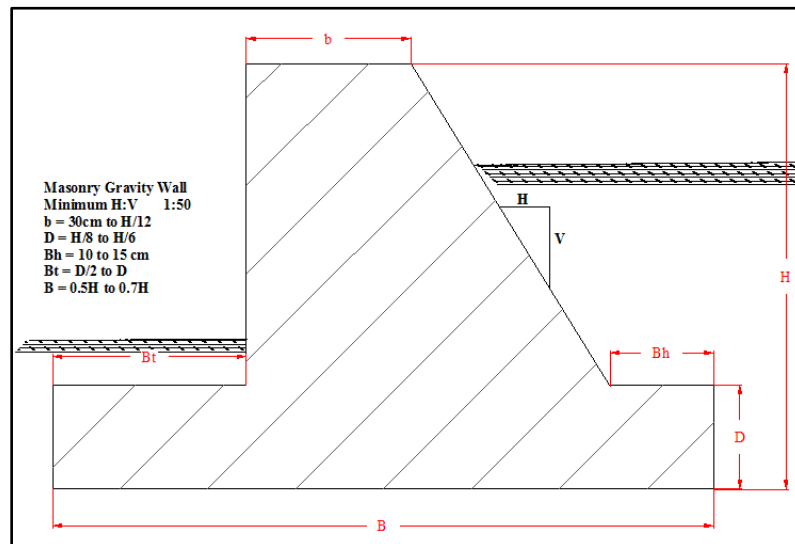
Alternative gravity masonry retaining wall arrangement
